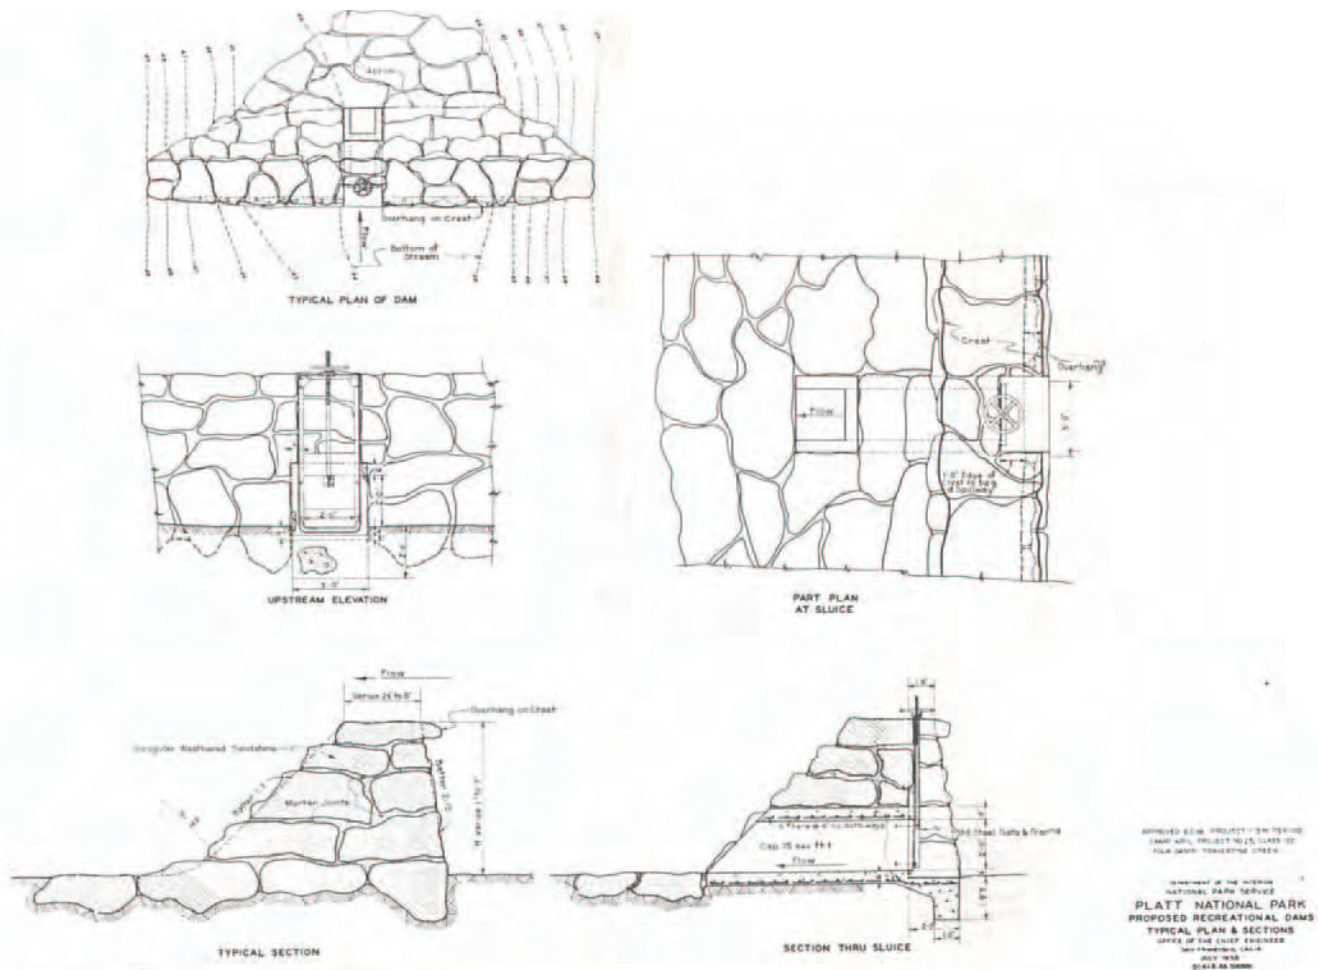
“Proposed Recreational Dams, Typical Plan and Sections,” Drawing NP-PL-5008, sheet 1, 1935.
